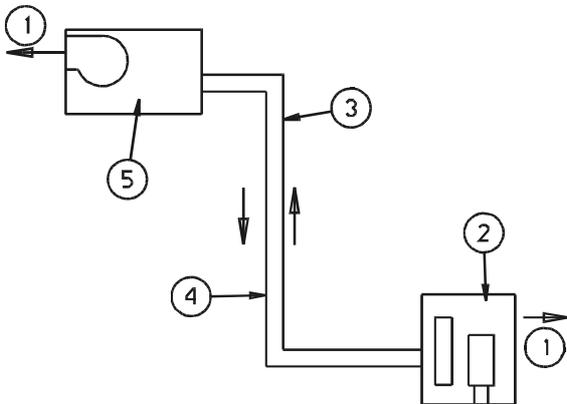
Connection of refrigerant tubing - Outdoor Unit above Indoor Unit
